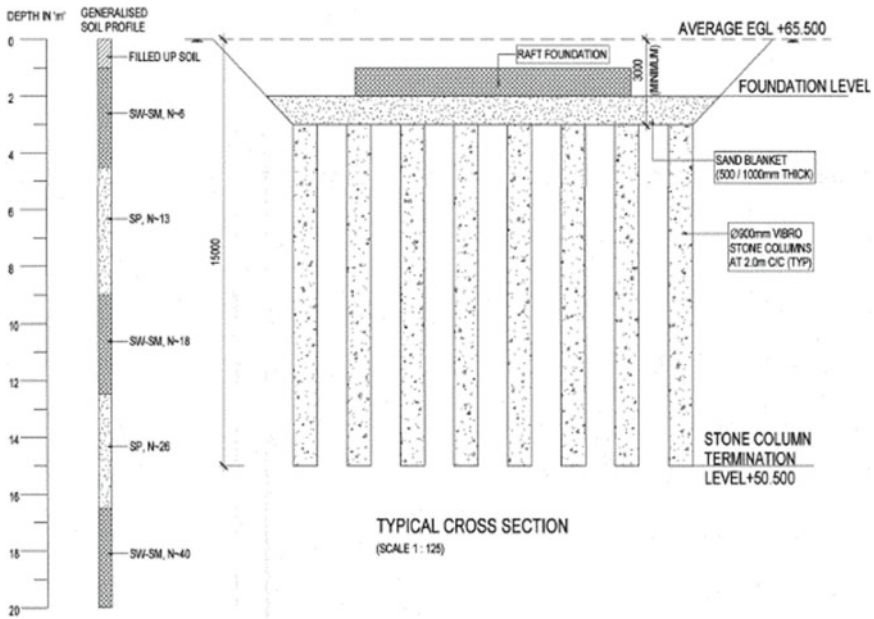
Sketch showing the typical arrangement of the stone column below Raft
